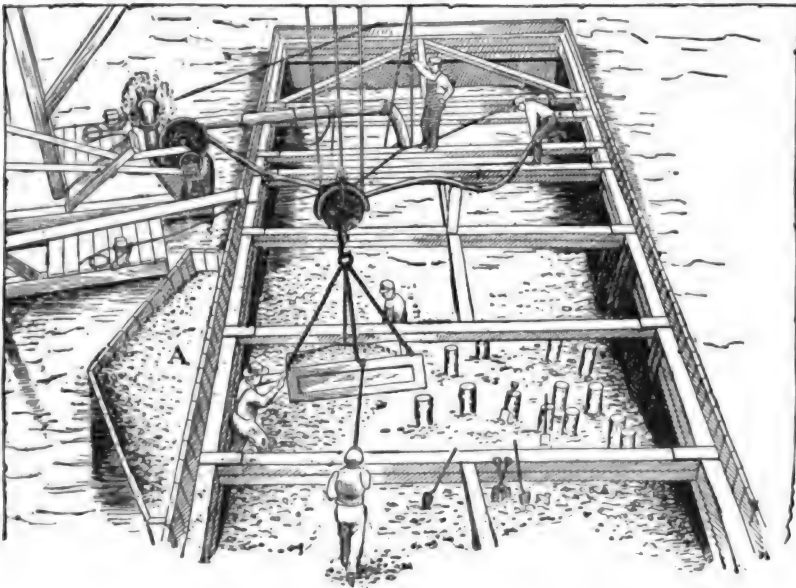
TOPEKA BRIDGE, COFFER-DAM No. 4.
